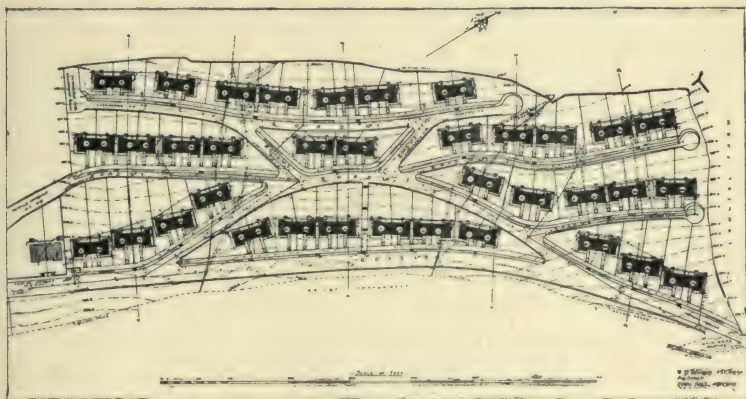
Aberdare, Cwmneol Housing Scheme, showing use of single-sided roads on steep slope. W. D. Jenkins, Architect.
